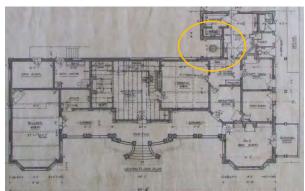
Location of kitchen range ash pit as shown (circled) on the original ground-floor plan.
